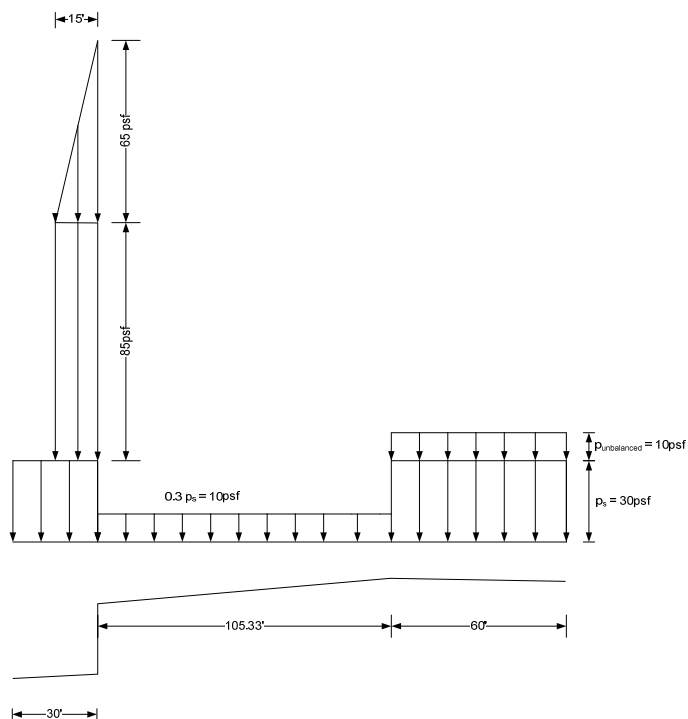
Case 2: Unbalanced Snow Load for East Direction Sloping Roof with Drift Load and Sliding Load on Lower Roof
